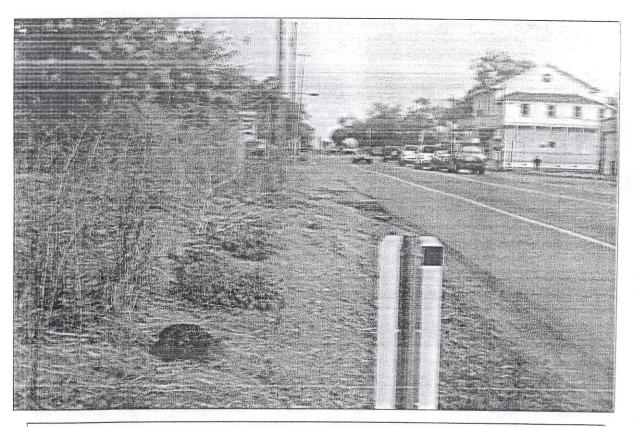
Photo D. State Route 4, facing intersection of SR 4 and Escalon-Bellota Road.
